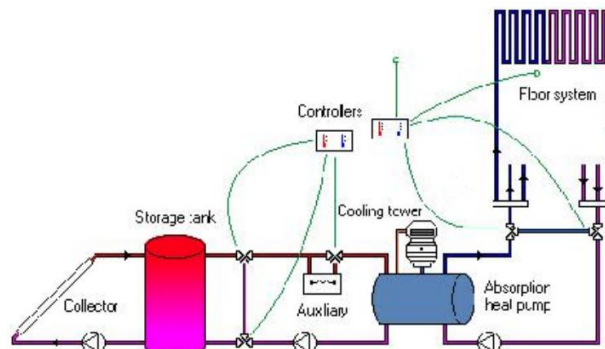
Schematic of System Plan for Solar Thermal Installation in a Residential Building
